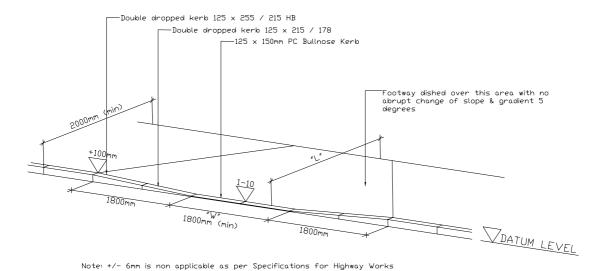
Dropped Kerb Detail at Designated Pedestrian Crossing Point
